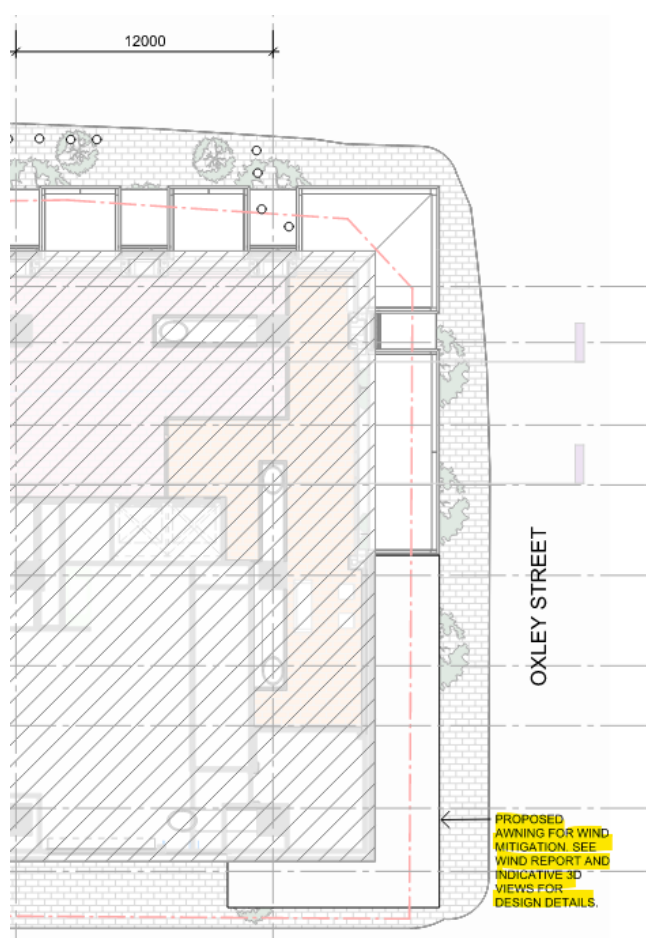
Ground Floor Plan, annotated showing proposed awning (Source: Woods Bagot)
